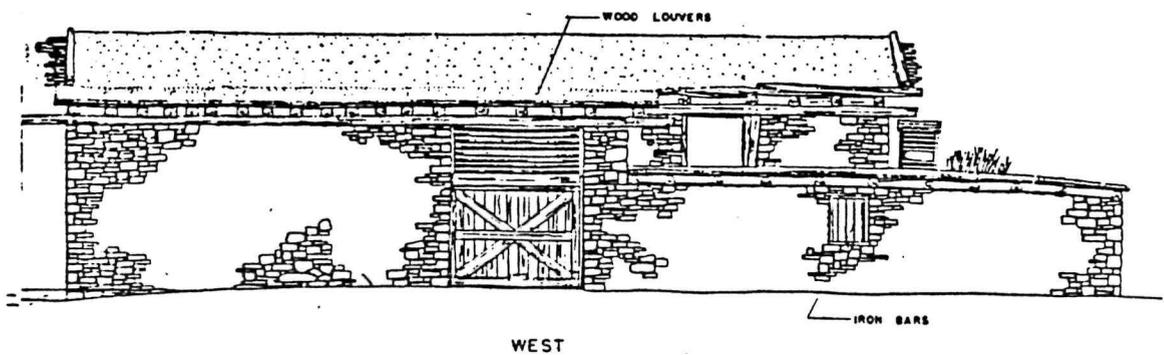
Hubbell Trading Post National Monument. West elevation of Hubbell barn showing part of upper roof. Note the new stabilized earthen roof.
